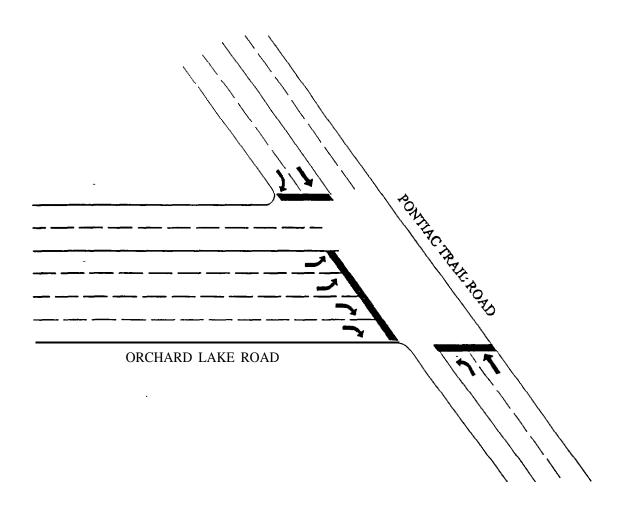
Layout of Orchard Lake Road & Pontiac Trail Road Intersection
